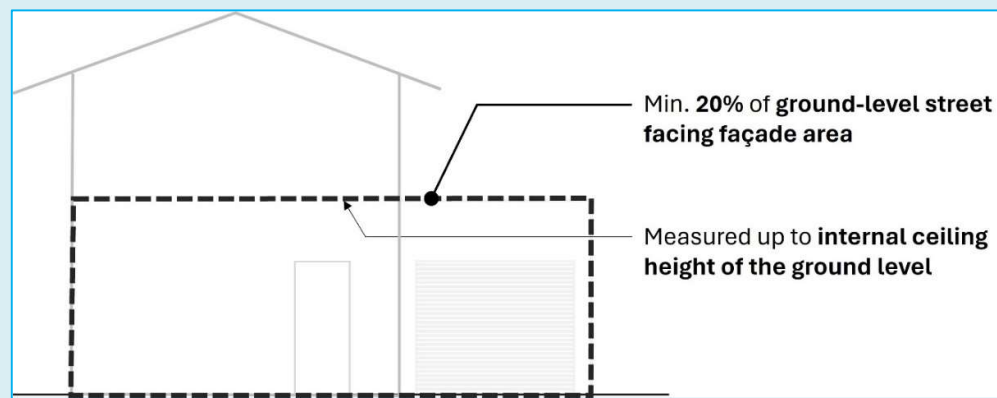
c: Street facing façade area – two storey unit
